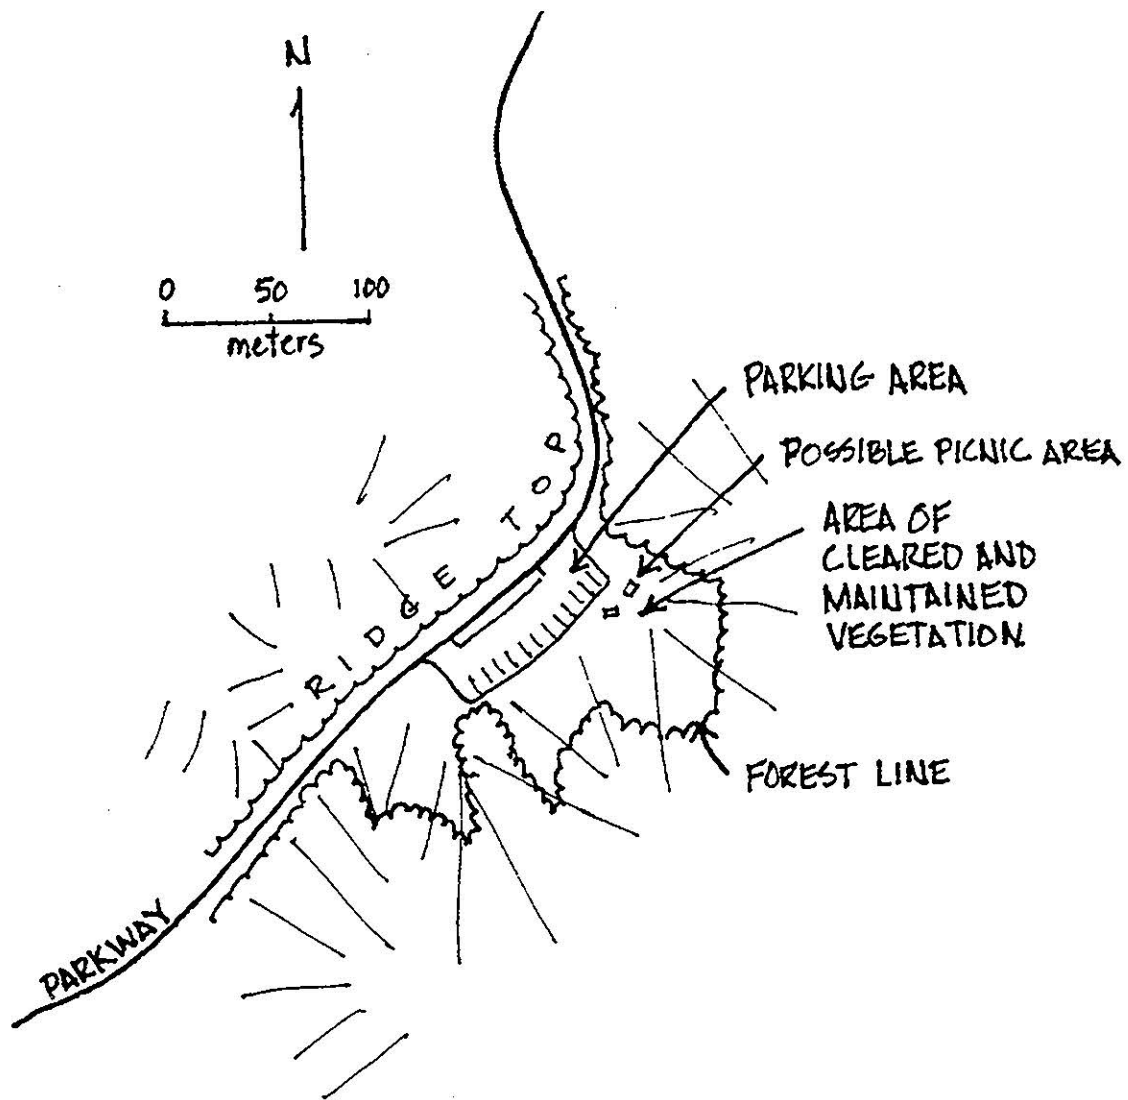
A plan sketch of site 7A showing vegetation clearing, parking arrangements, and direction of views.
